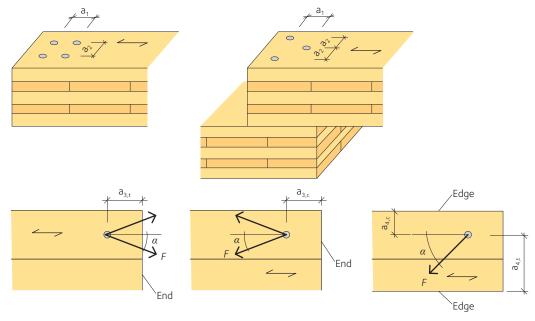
Minimum centre spacing and edge spacing for nails, wood screws and dowels in the CLT panel's plane.
